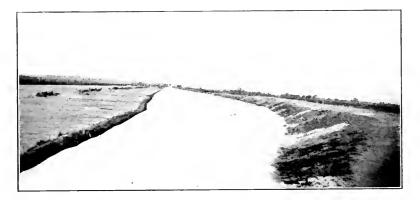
Reinforced Concrete Facing, on Levee 25 Feet High, Near Sacramento, Cal.
